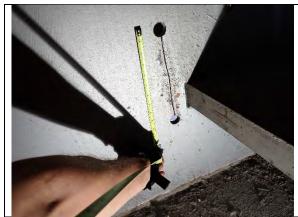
View of West Face of Diaphragm 2 on Top of Tie Plate. Typical Triaxial Detail on Pier Cap Interior, Looking East.
